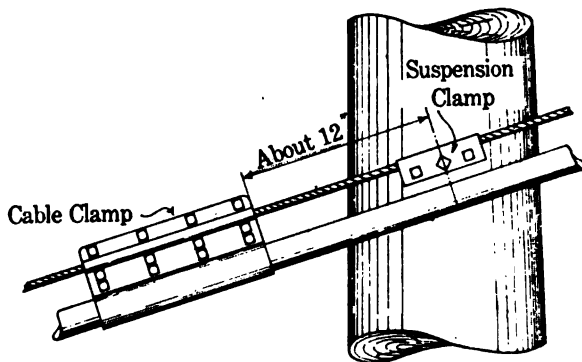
CLAMPING CABLE TO MESSENGER ON STEEP GRADES
